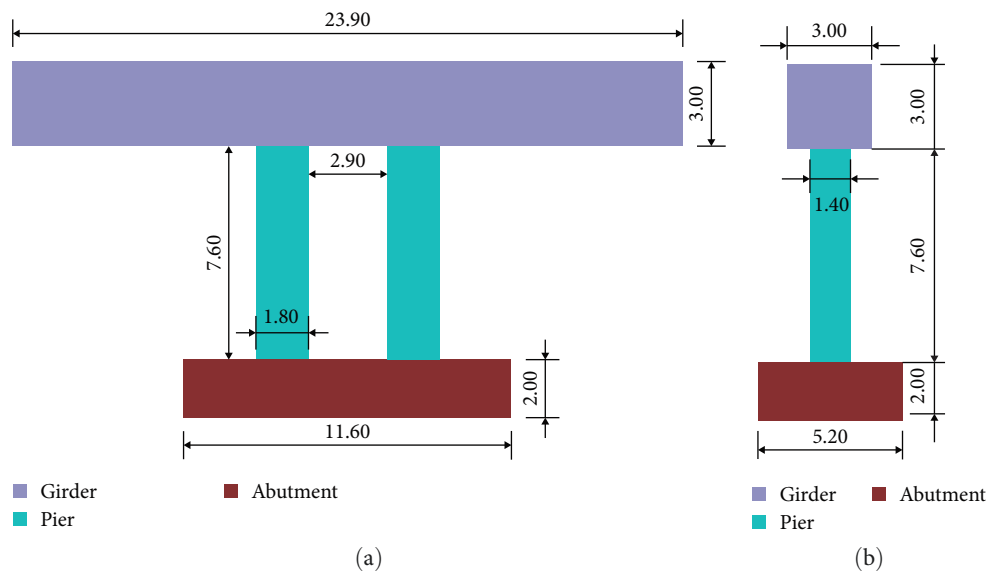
Dimensional detail of precast assembled pier (unit: m): (a) main view; (b) side view.
